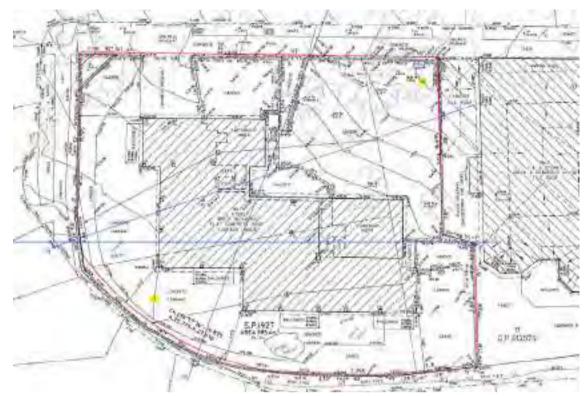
Survey Plan, Dwg Name 19099A detail Issue 6
